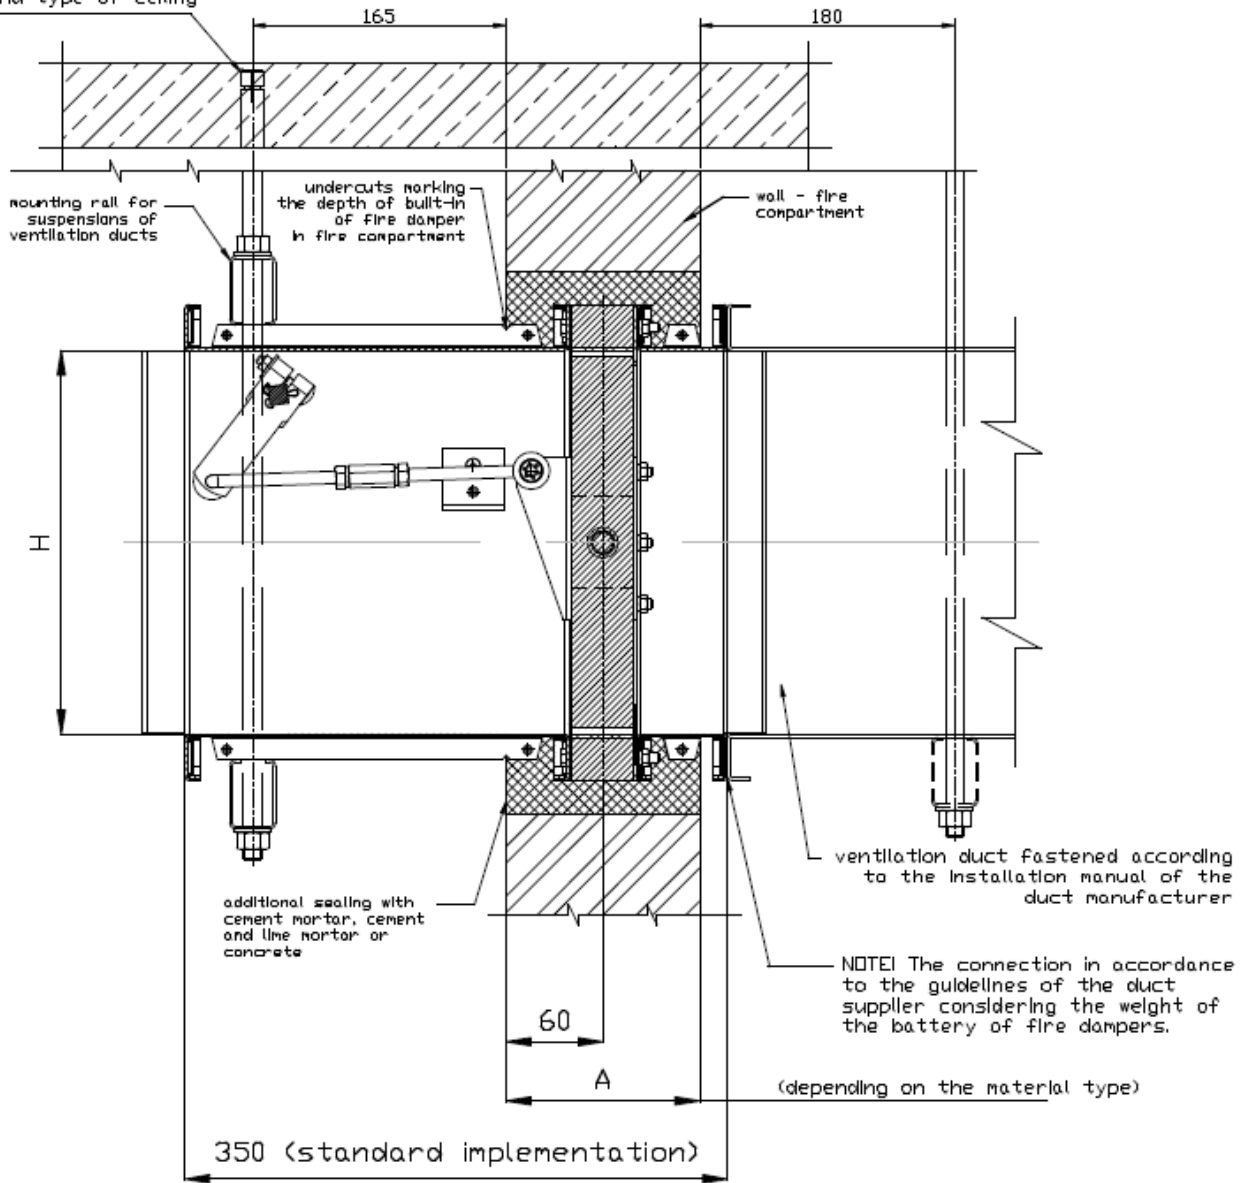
Installation of a battery consisting of two fire dampers KWP in horizontal arrangement in rigid compartment – side view.
